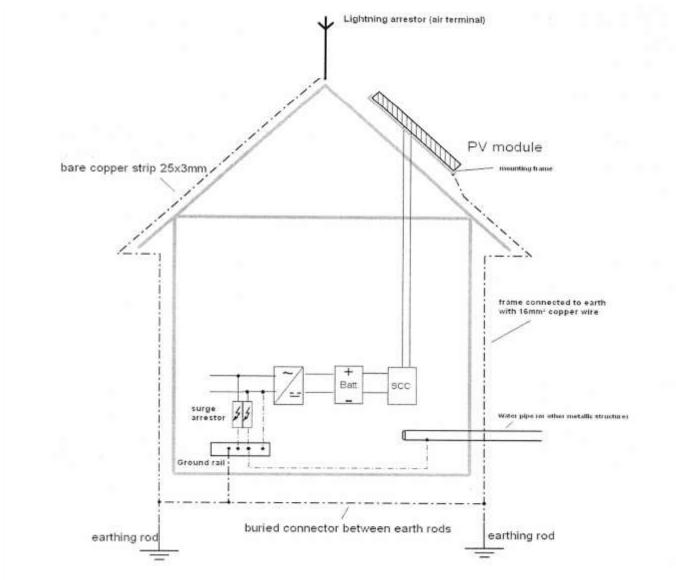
Equipotential bonding for grounding and Lightning protection for a solar-PV site
